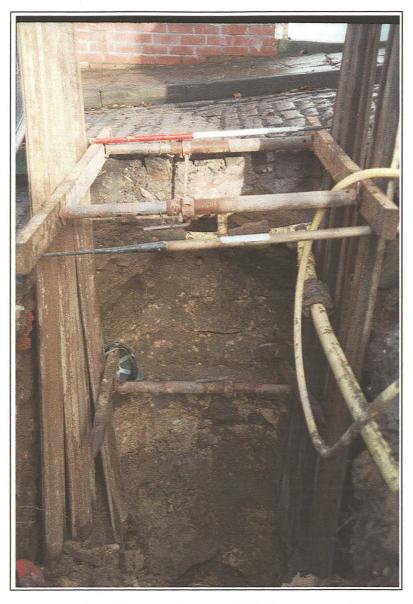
General view of limestone wall at edge of Christ's Hospital Terrace - looking north
